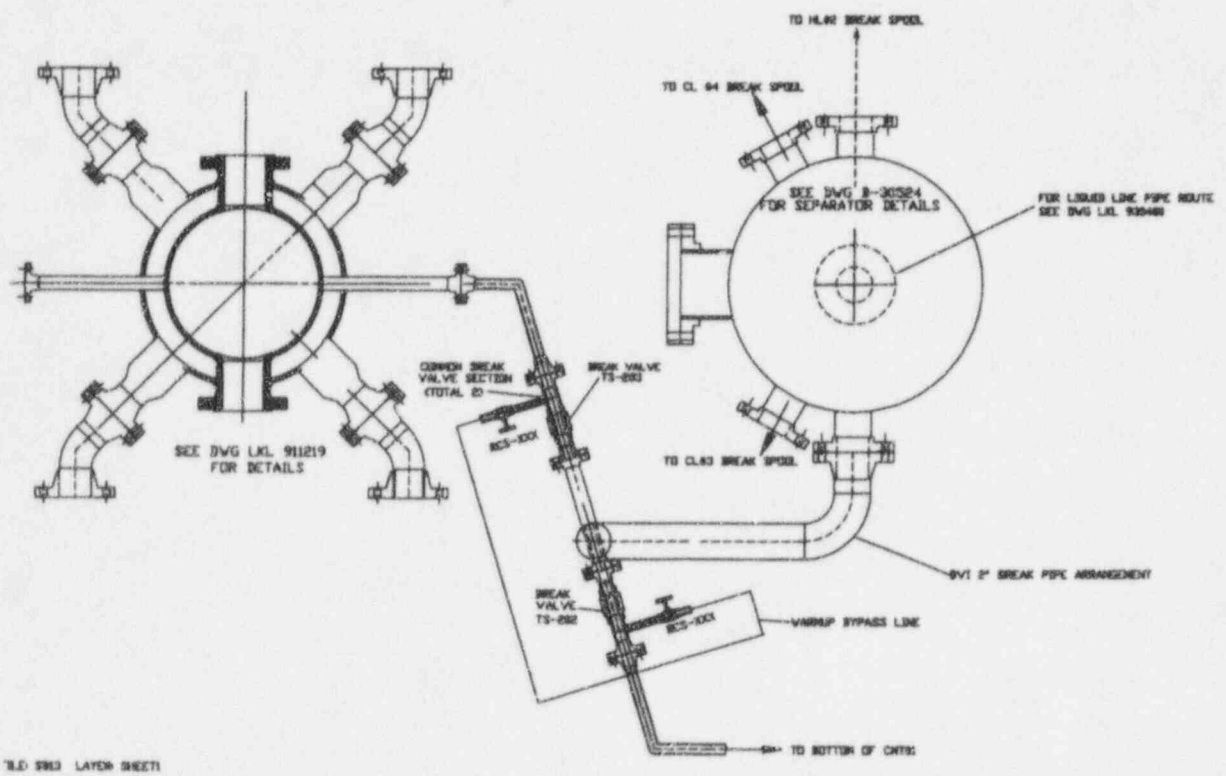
Primary Loop and Break Piping Layout
